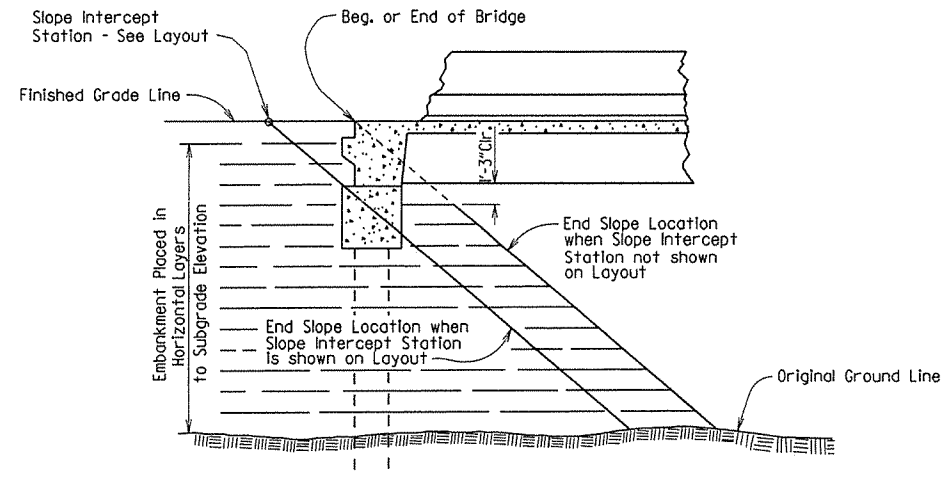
DETAILS OF TYPE SPECIAL 2 APPROACH SLAB BLACK RIVER RELIEF
